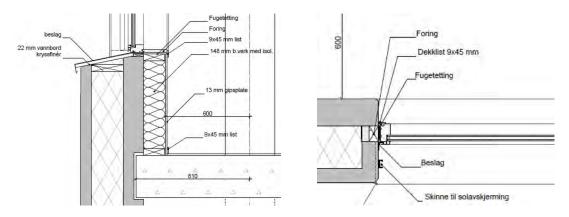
typical vertical and horizontal detail of window mounted into the prefabricated concrete element (ill. PKA Arkitekter AS, Trondheim). The internal insulation on the warm side of the concrete element has not been executed due to building physical problems; this is a preliminary detail (left image).
